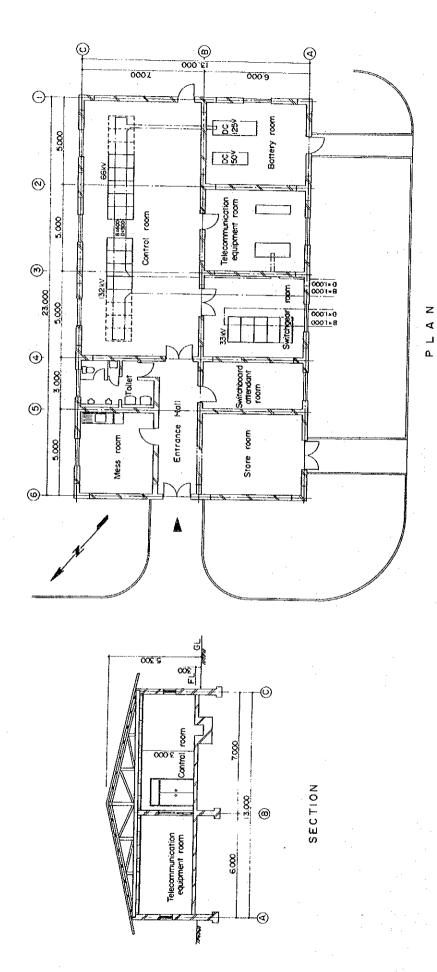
SHARPEVALE SUBSTATION CONTROL BUILDING
